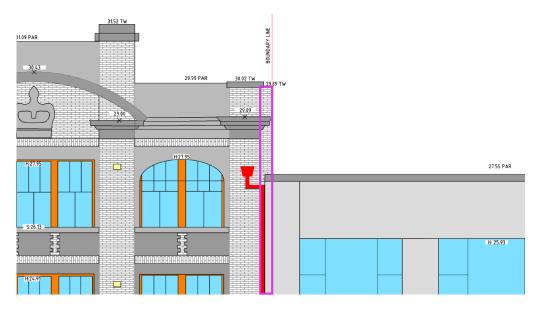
Survey elevation prepared by Beveridge Williams showing the shared party wall outlined in pink
